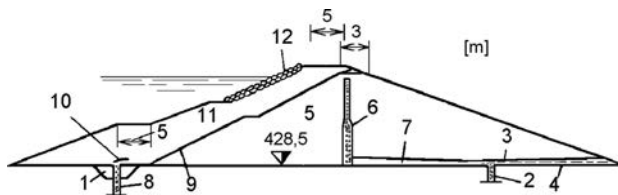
Valence d'Alby Dam (France). (1) Trench around concrete cutoff; (2) drainage trench; (3) drainage; (4) drainage pipe; (5) upstream shell; (6) vertical drainage; (7) drainage offtake; (8) concrete cutoff; (9) geomembrane; (10) additional cover membrane; (11) protective layer of sand; (12) rockfill.
